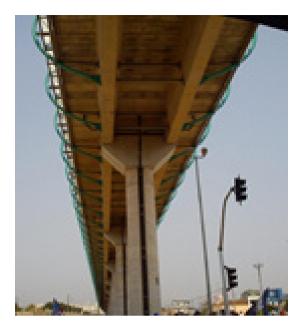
Example of a two lane elevated deck infrastructure for the LRT. Source: MECCA, 2013.
